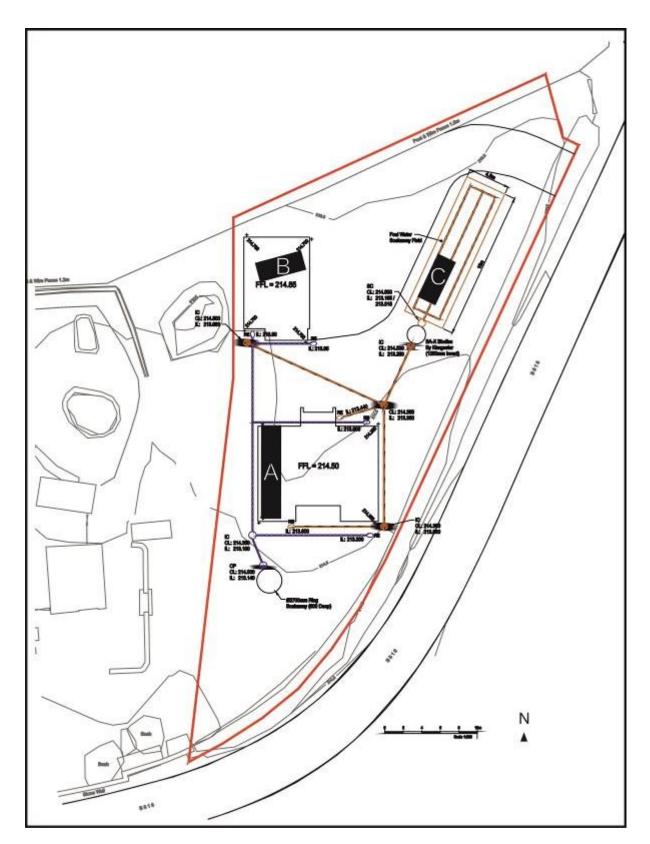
Location plan of trial trenches A, B and C (based on supplied architects plan)
